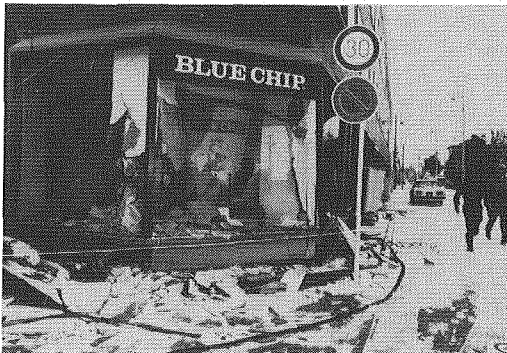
Damaged show window and collapsed column of Hachinohe Commercial and Industrial Association Office. *(Photo by Daily Tohoku)
